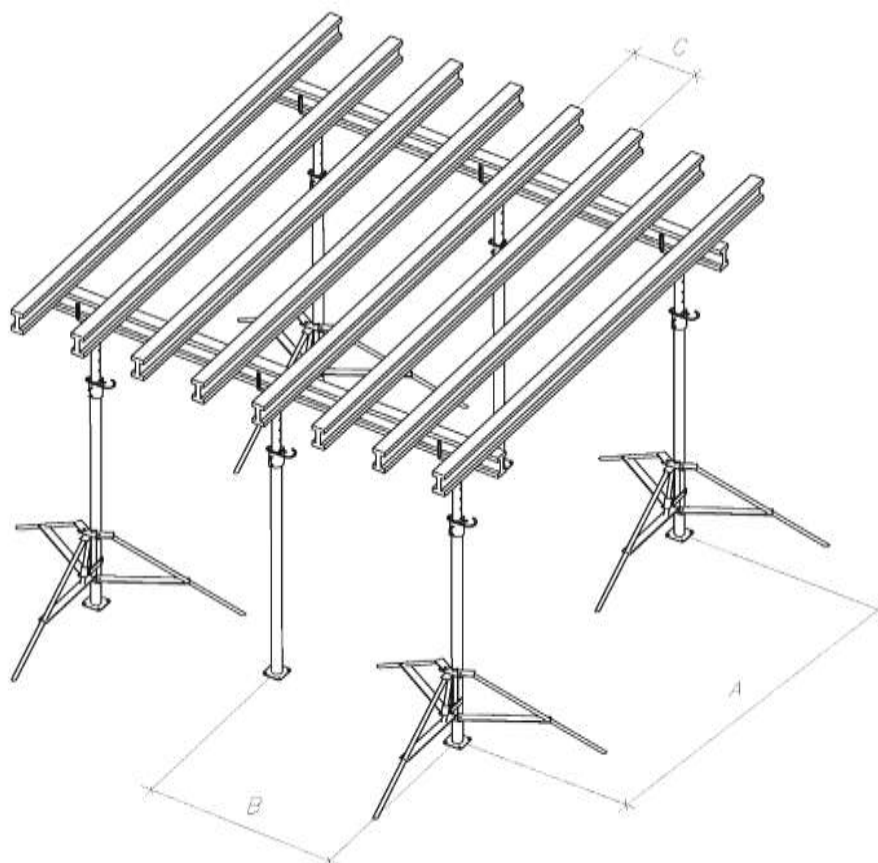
The location scheme of the main and secondary racks, main beams, secondary beams
